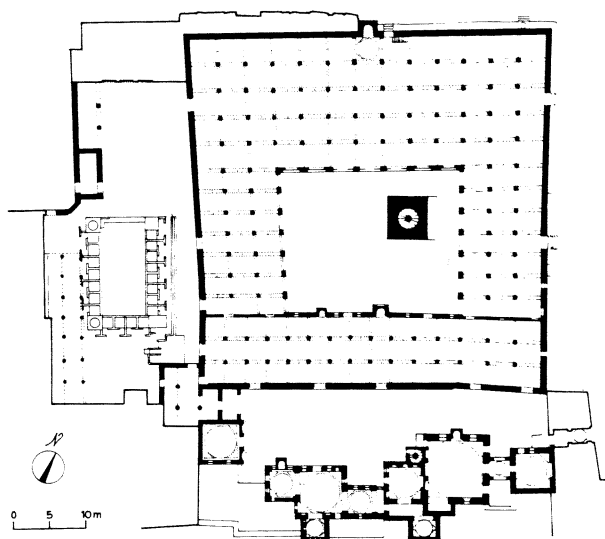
Ša'da: Ġāmi' al-Hādī, the plan.
